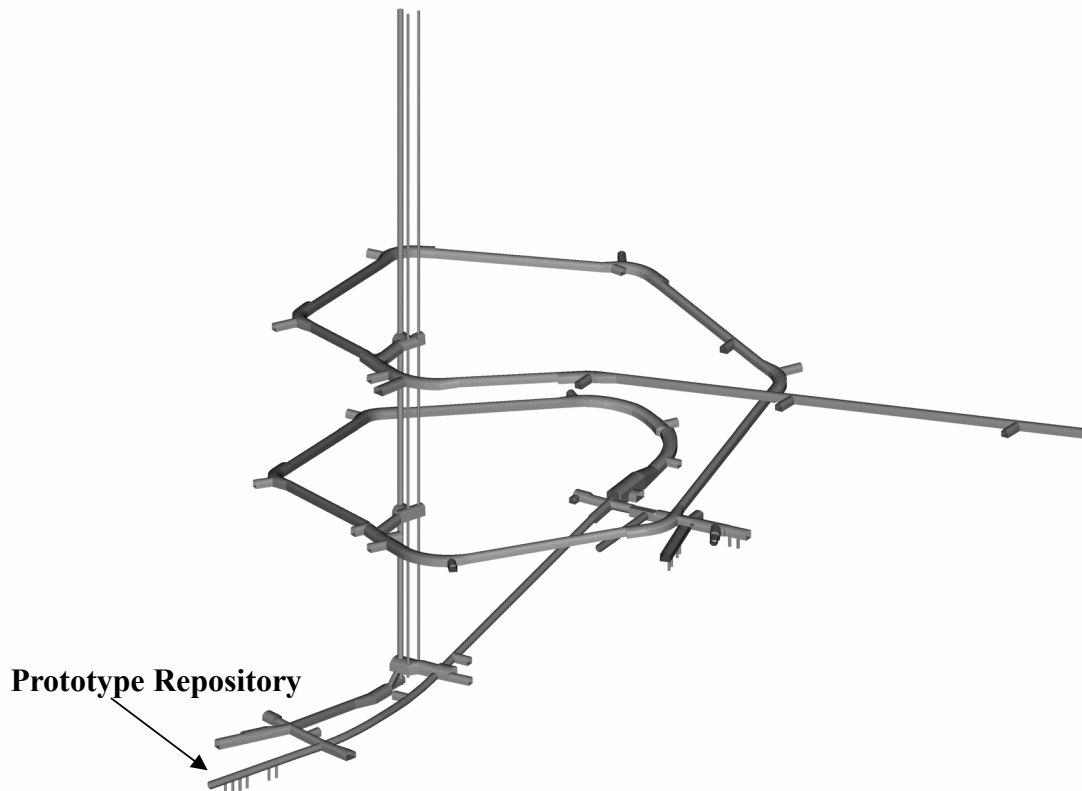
Plan view over Äspö Hard Rock Laboratory.
